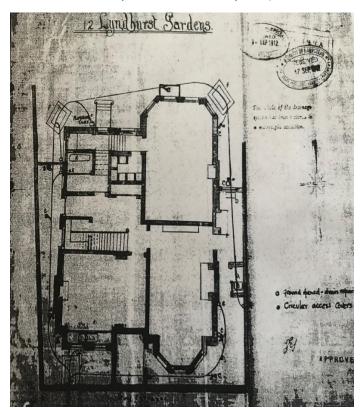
Basement plan of 12 Lyndhurst Gardens (1912; Camden Council Archives)
